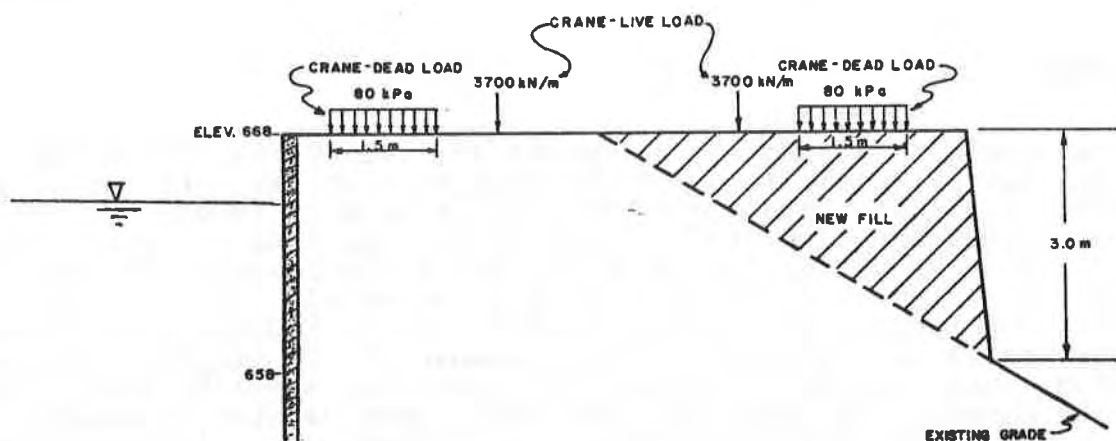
Design Requirements for Cascade Dam Retaining Wall
